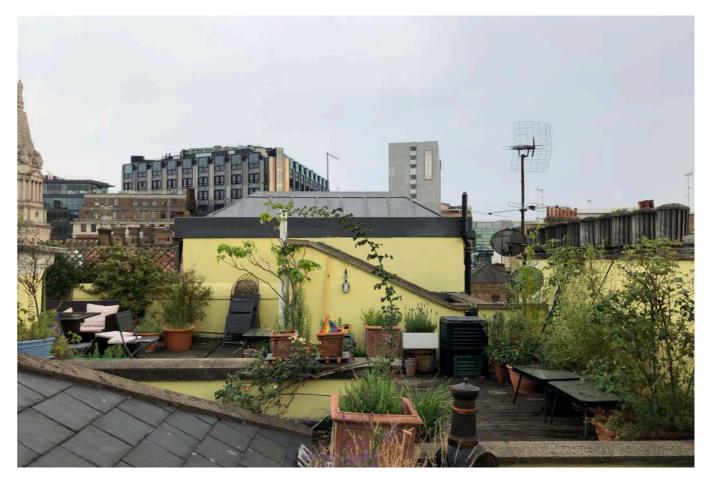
Existing roof structures and, boundary treatment & detailing at roof level
